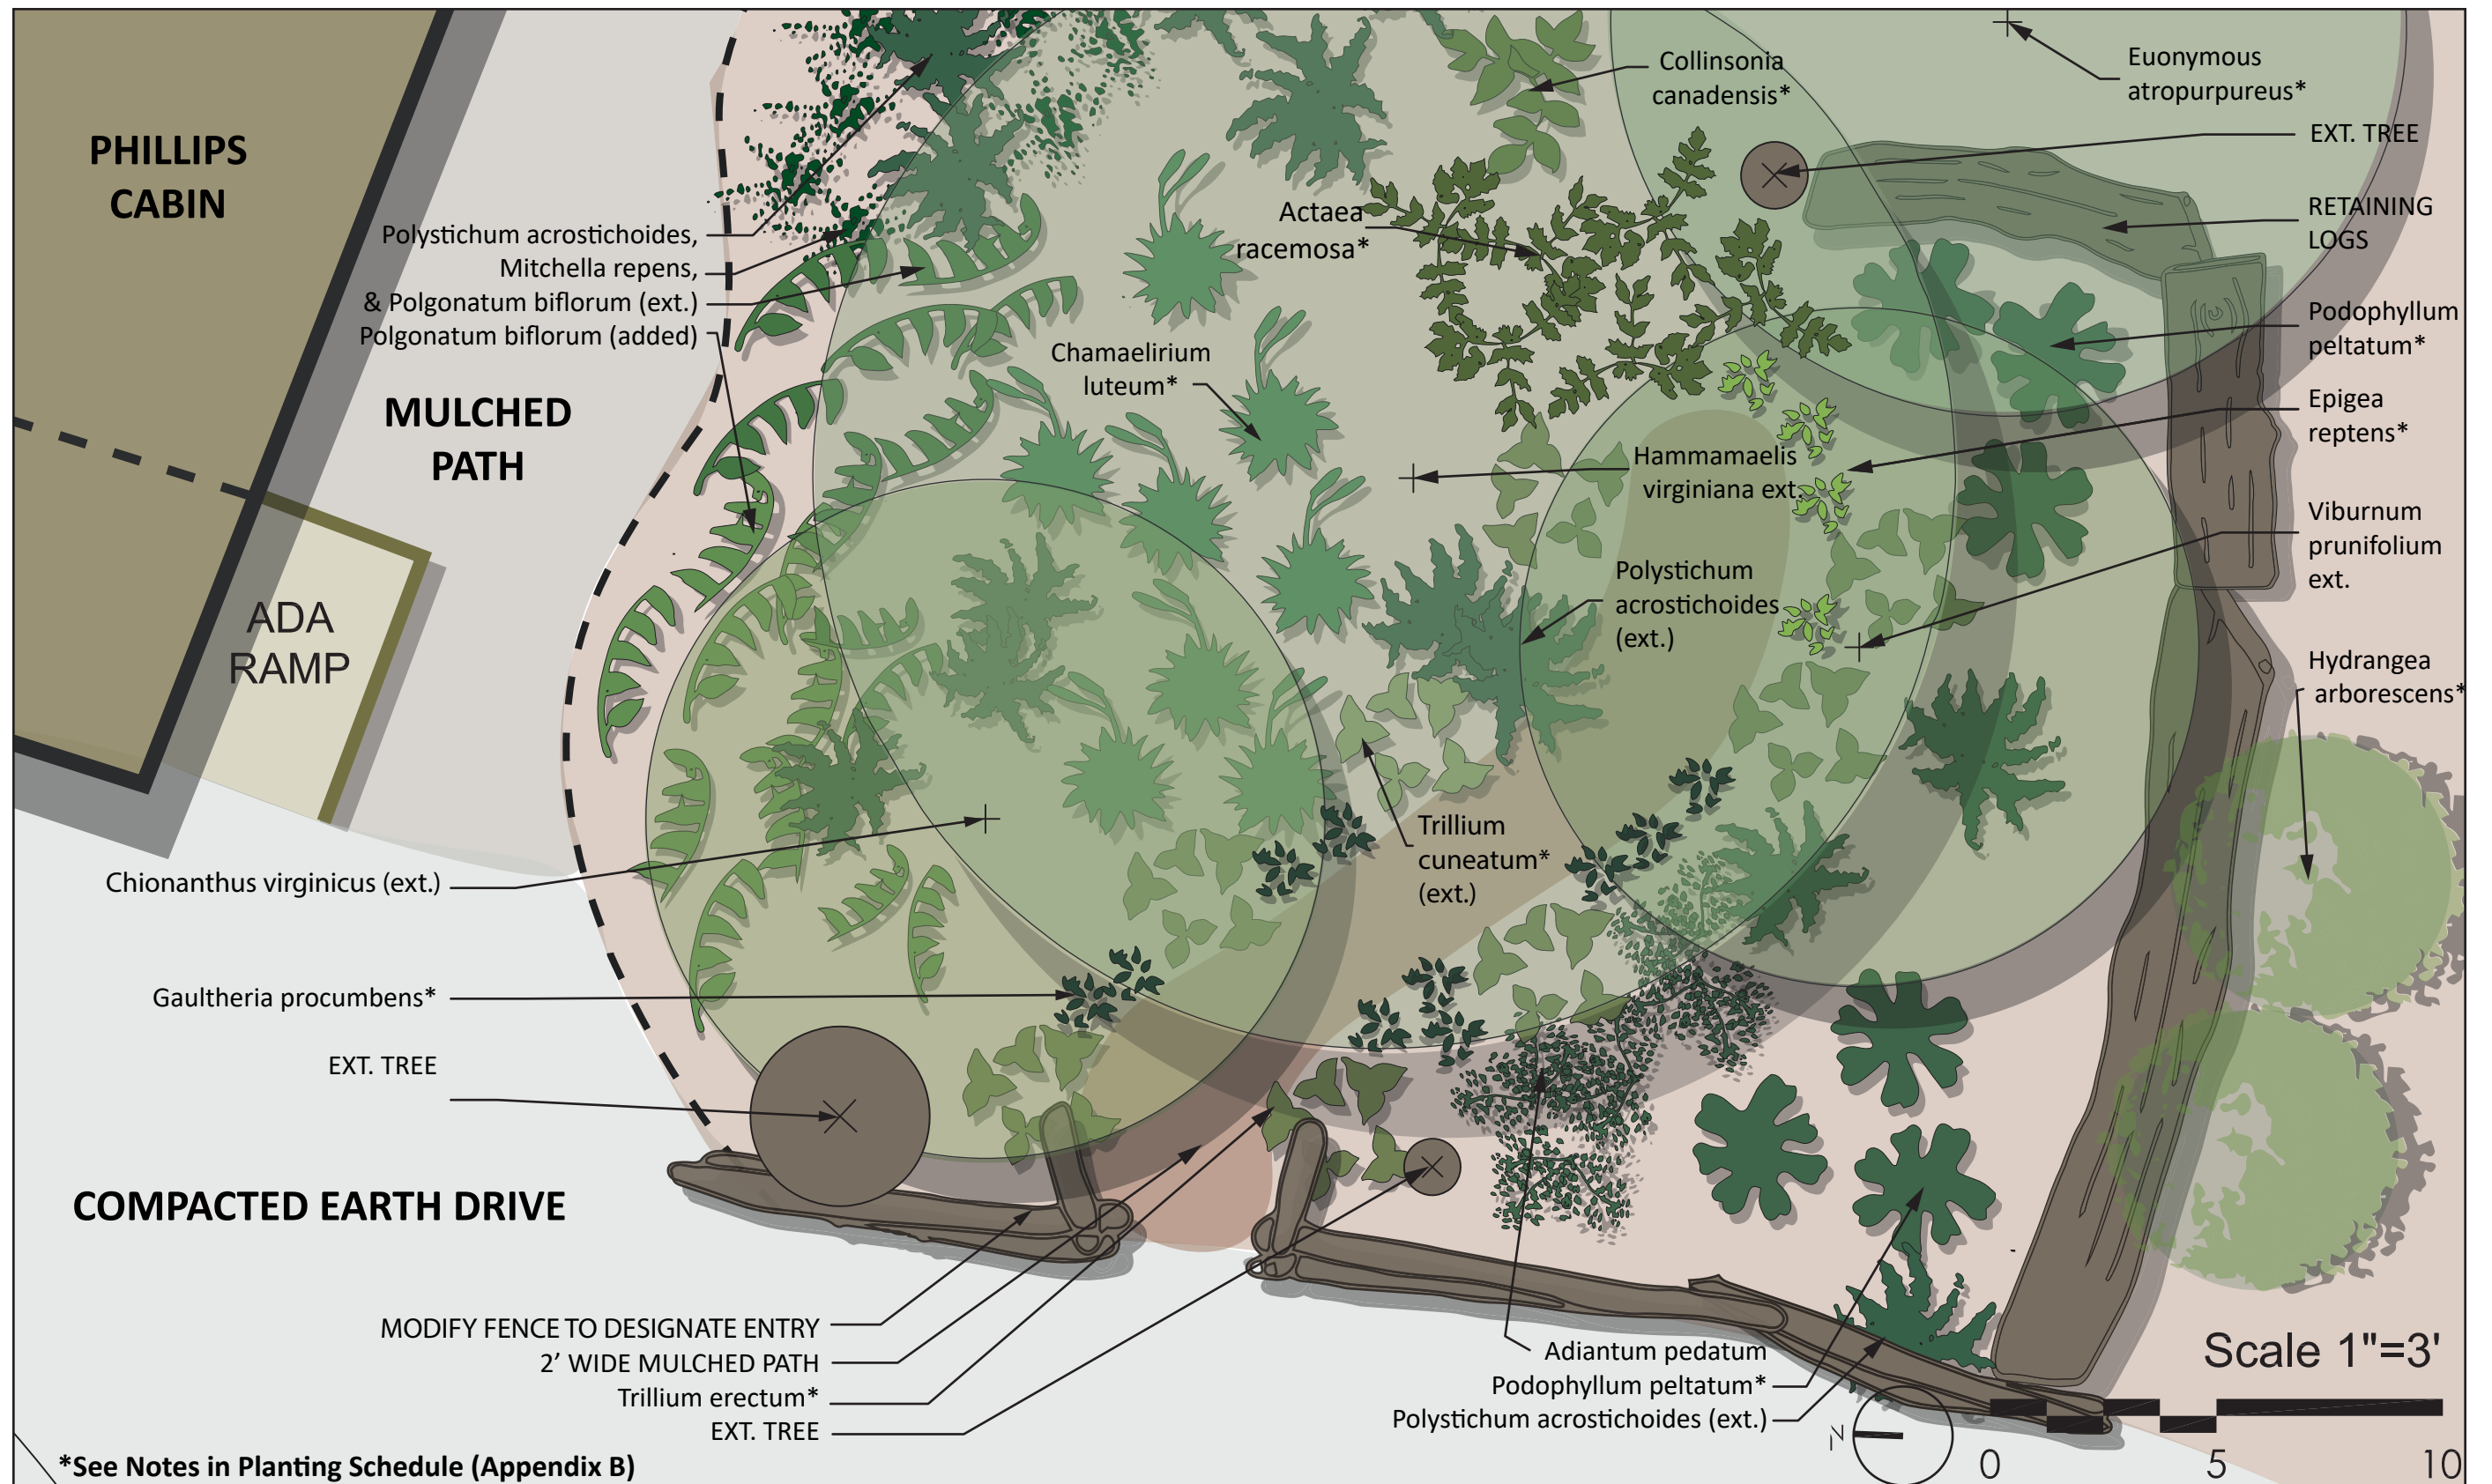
Revised Planting Plan Plot 2 (Image by author)
